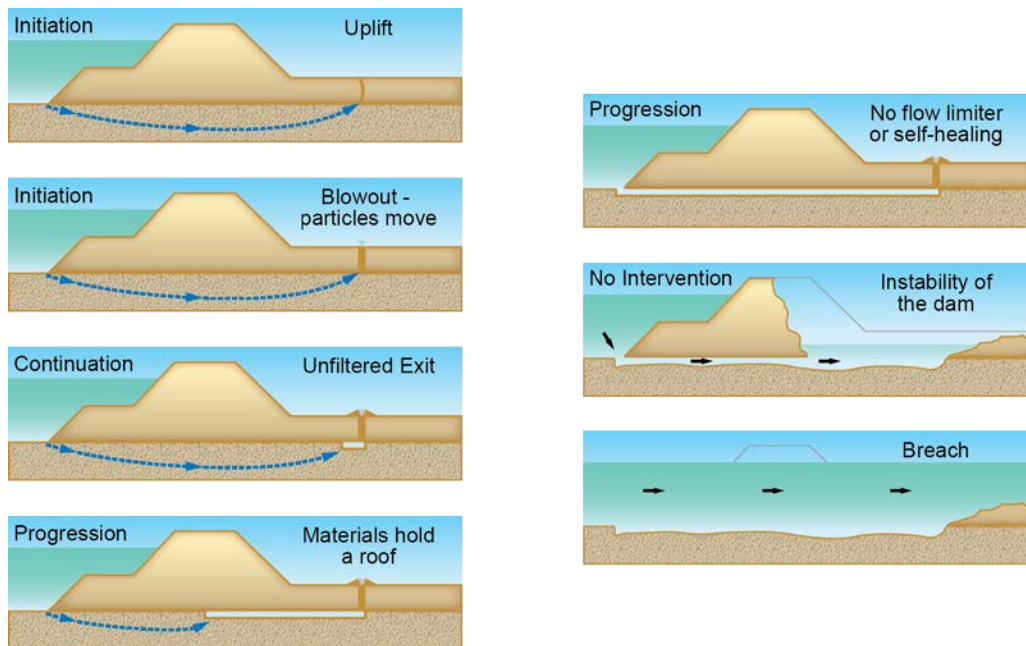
Foundation Backward Erosion Piping Model (adapted from [8])
